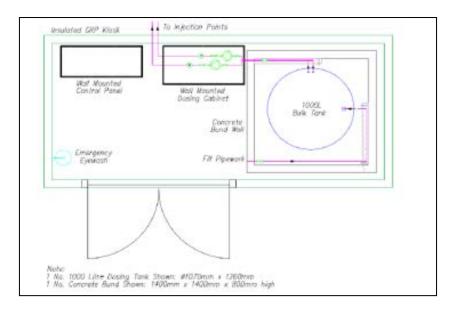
schematic of a bulk tank kiosk layout in H³PO<sup>4</sup> Installation with 500 litres< bulk storage ≤ 6,000 litres.
